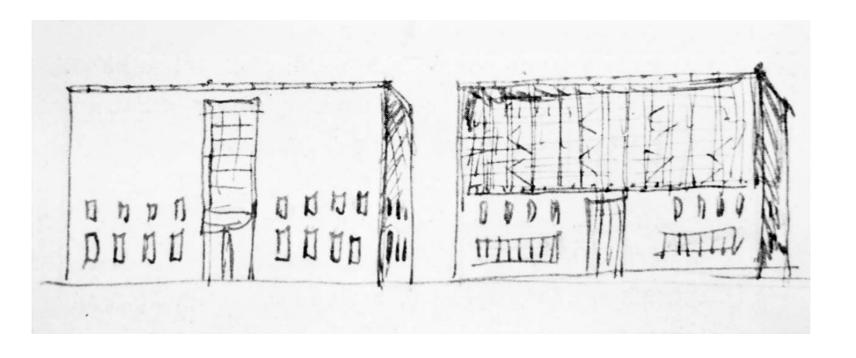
Ponti's sketches of the front building of the School of Mathematics dating back to 1944, after construction of the building (BBL drw 14)
